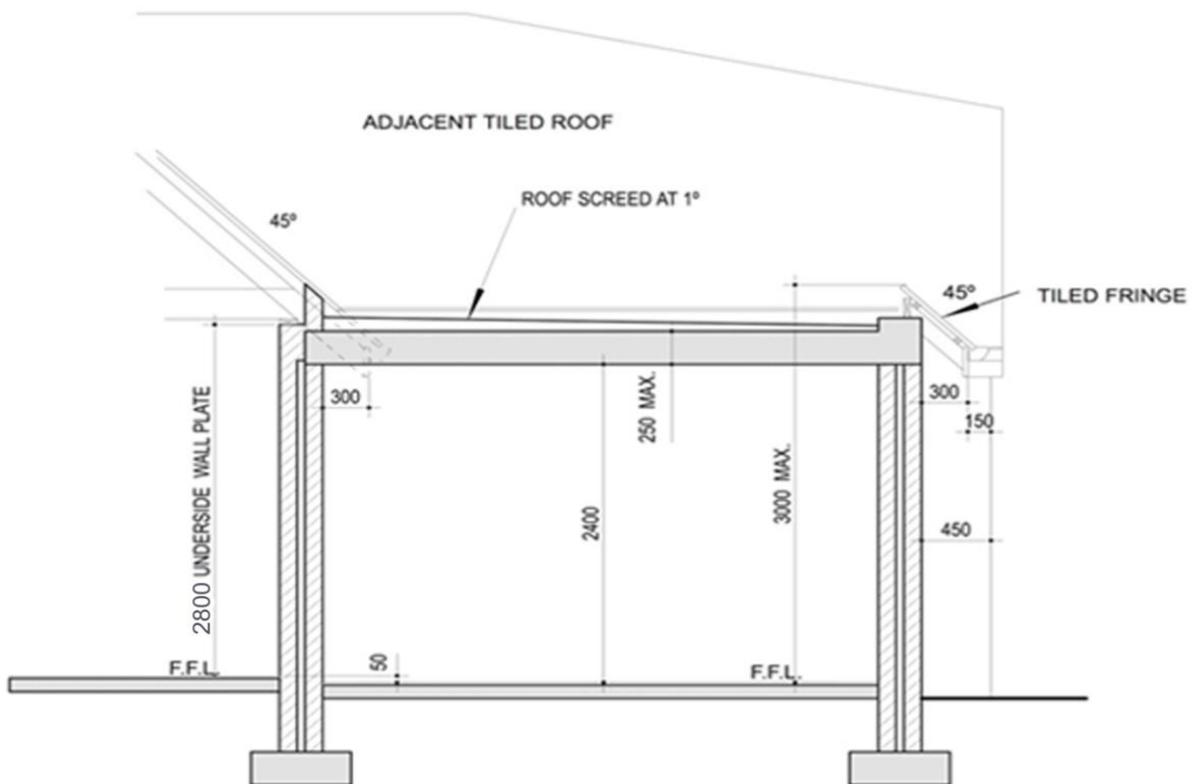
Typical section through Figure 10 - Flat roof with fringe between or butting against gabled wings.
